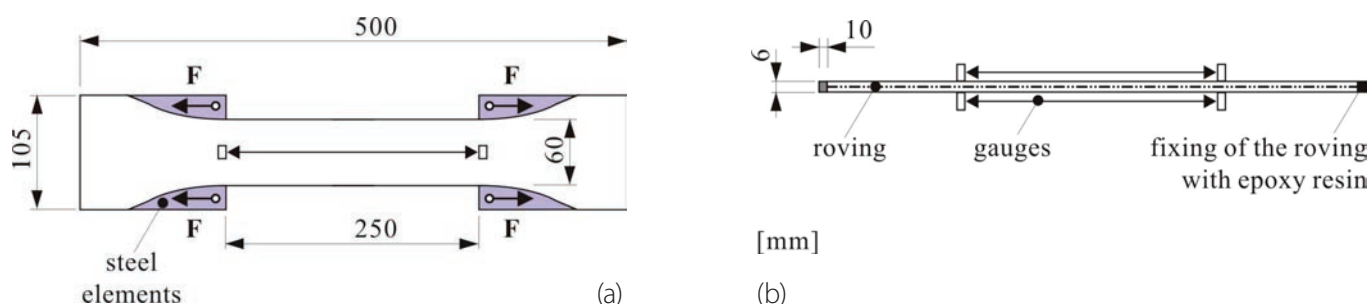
Testing of a TSP specimen: (a) top view of the specimen; (b) cross-section
